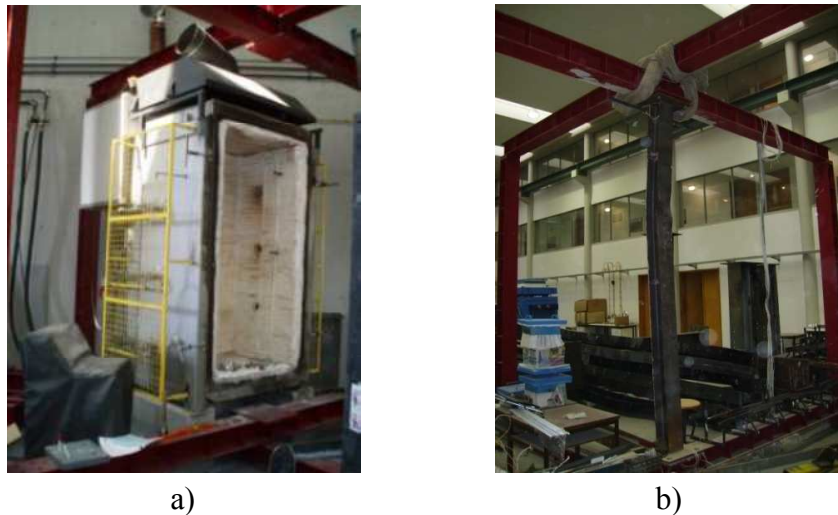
a) Test furnace b) Column in the restraining frame after test.
